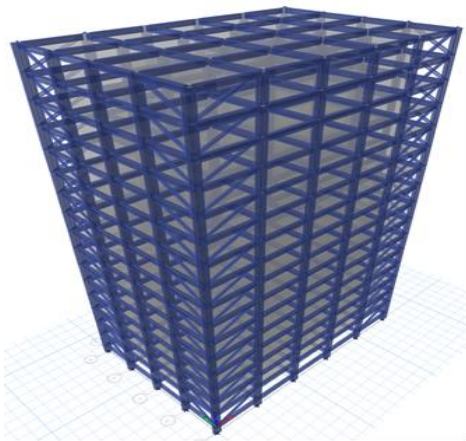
3D view of G+15 RC frame building with outer diagonal steel bracing
